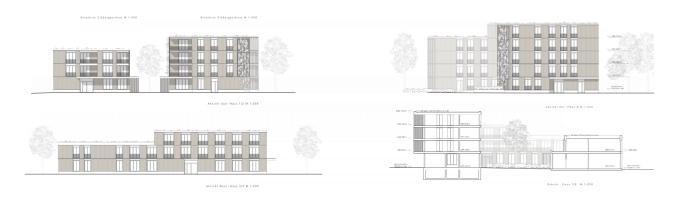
Planned section and facades of the buildings in GEWIN Gneis project.
